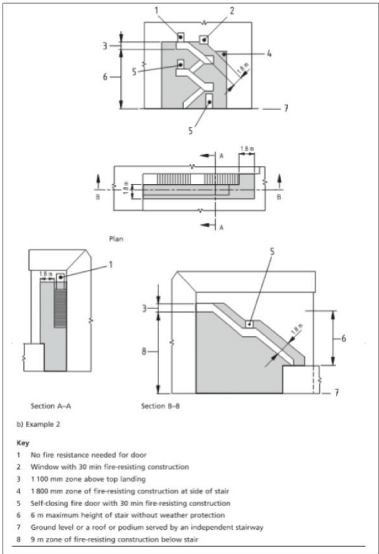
Fire Resistance of the Façade Near External Escape Stairs (Figure 16 from BS5999)
